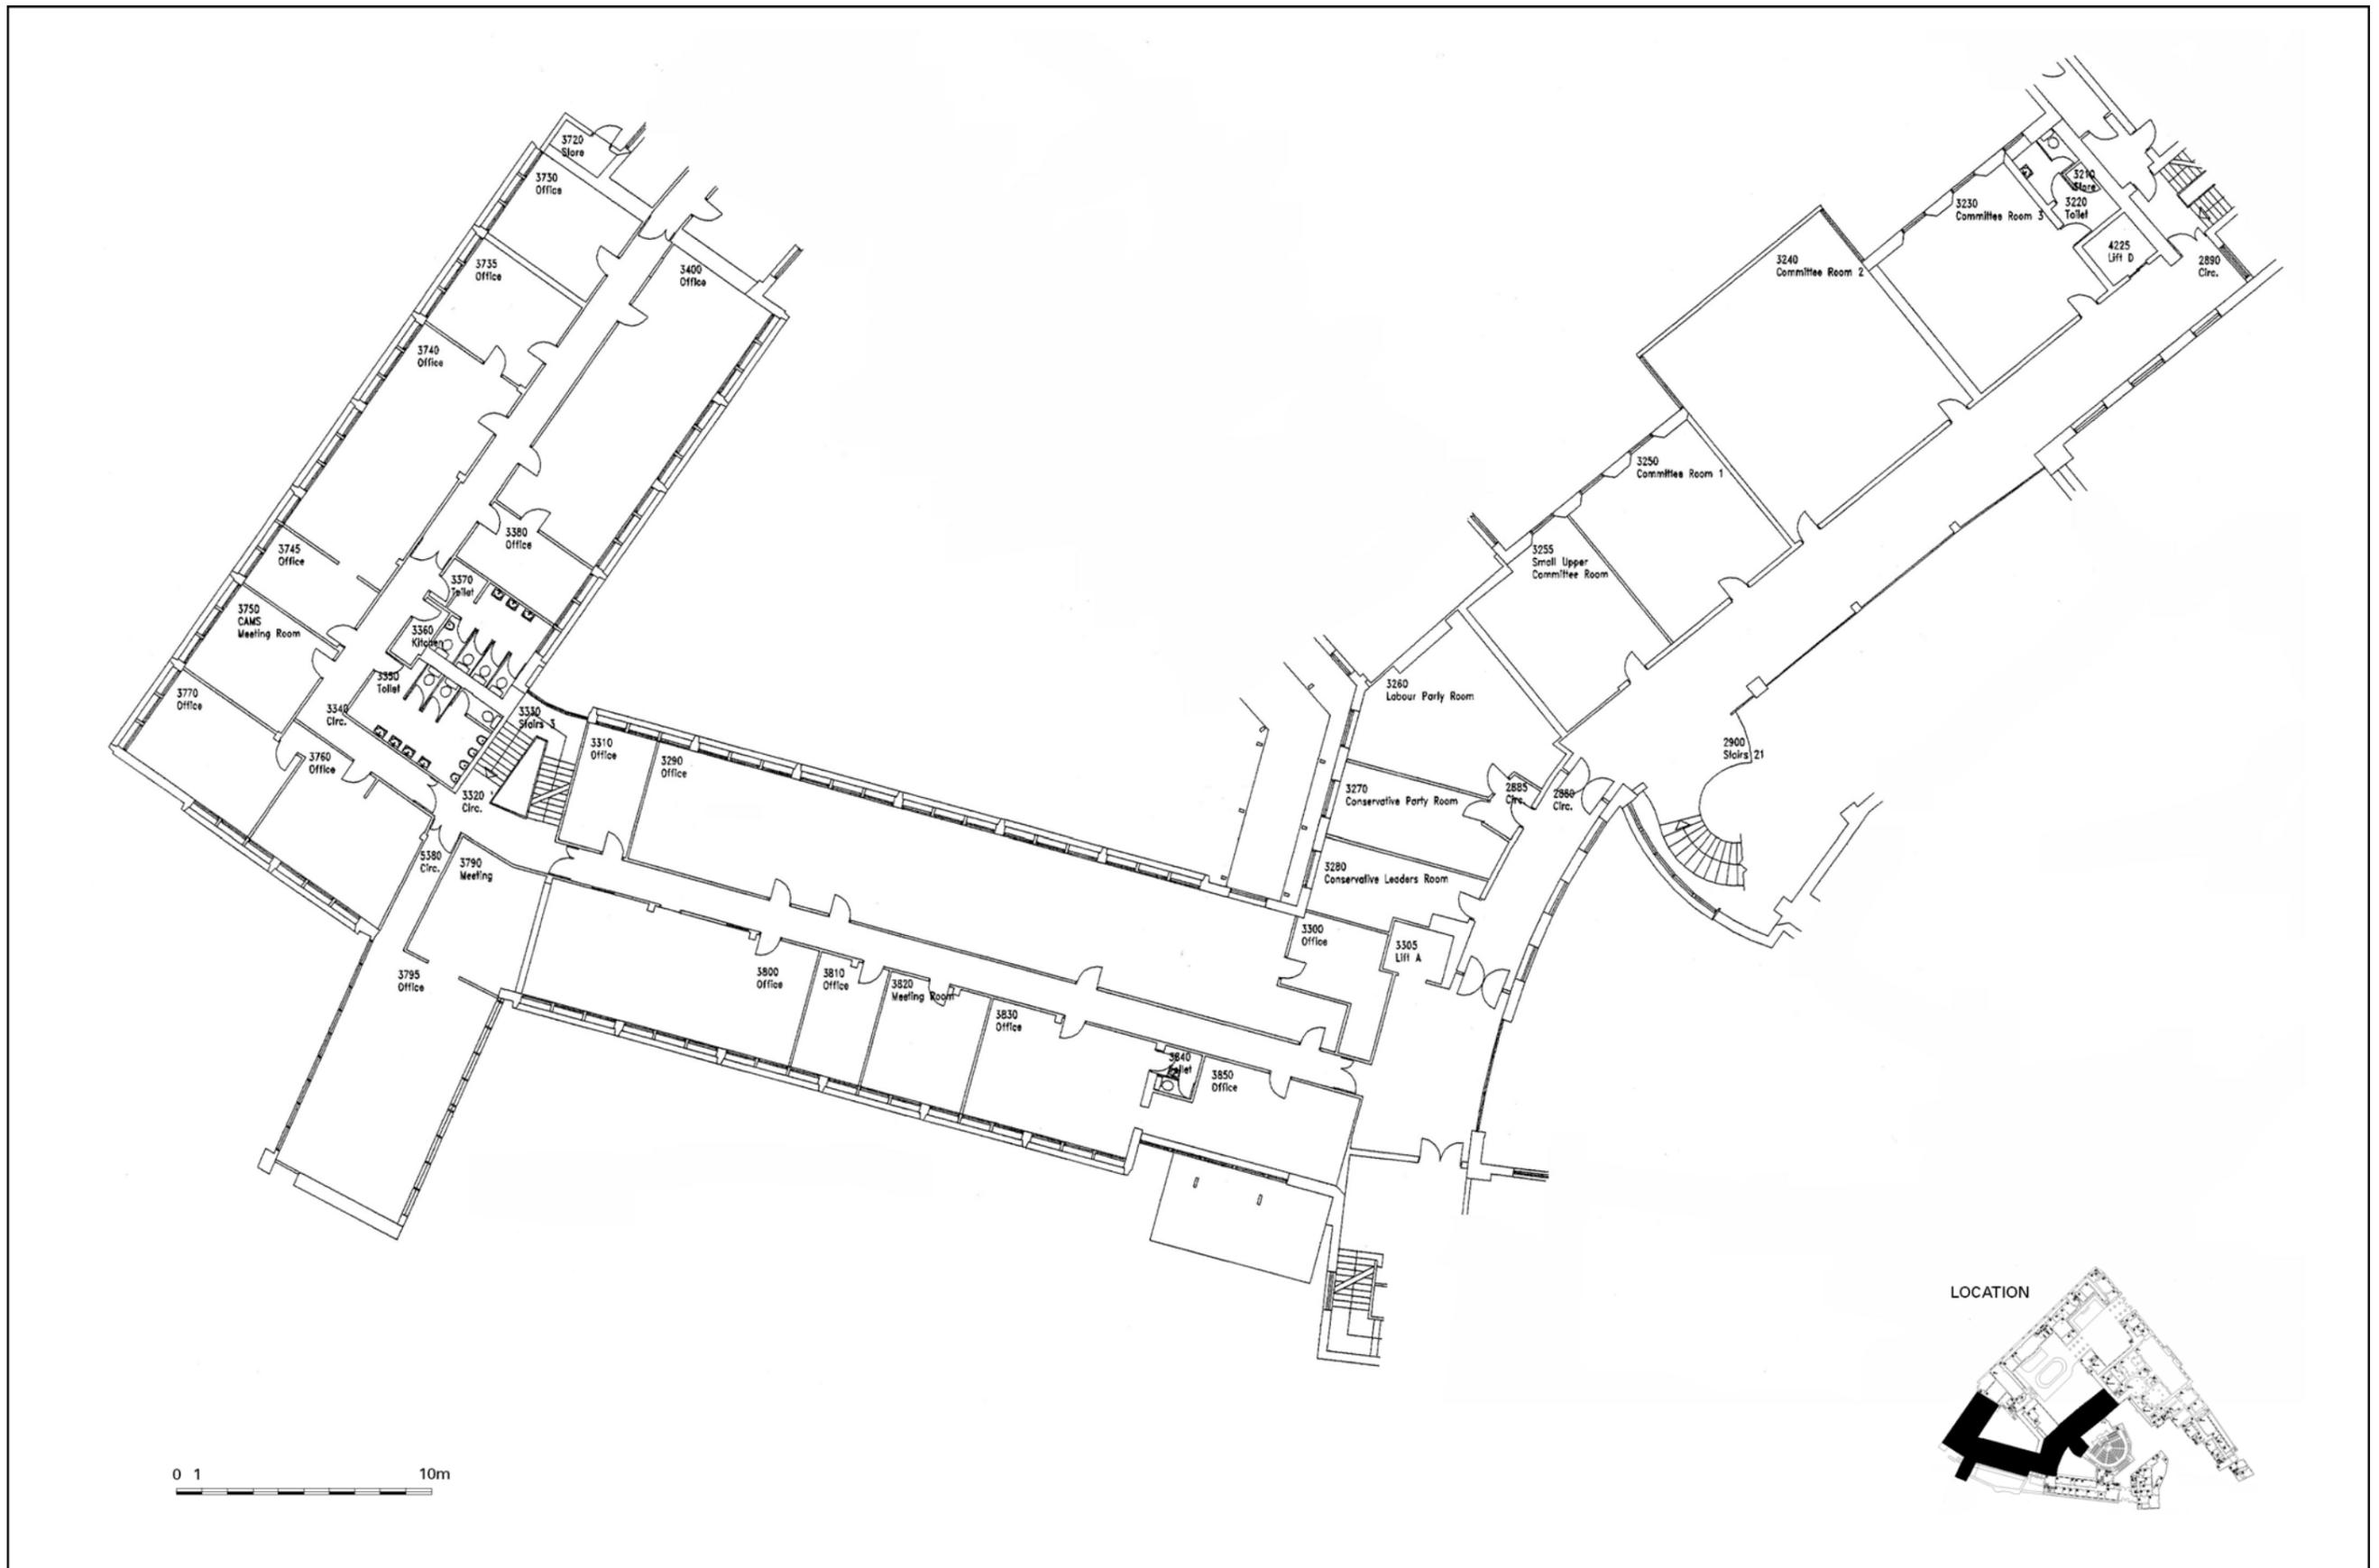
1966 Committee Rooms, Ante-chamber and Office, first floor plan
